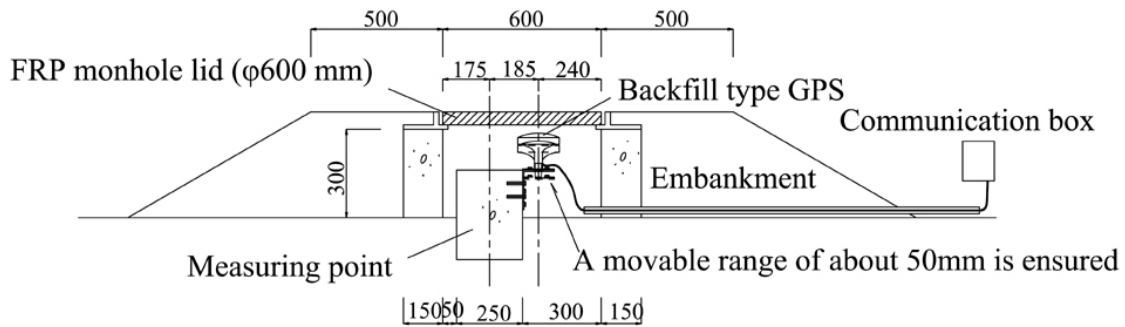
Structural diagram of the manhole - backfill type GPS sensor (G-1) installation
